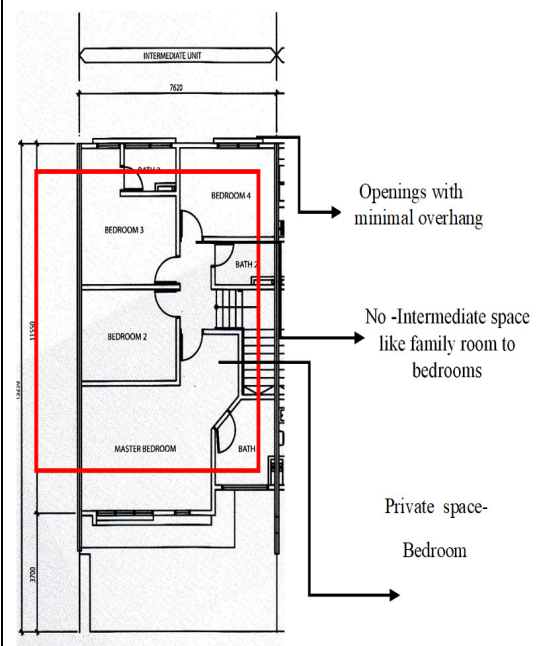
First Floor Plan of Terrace House, Licuala Garden Precinct
